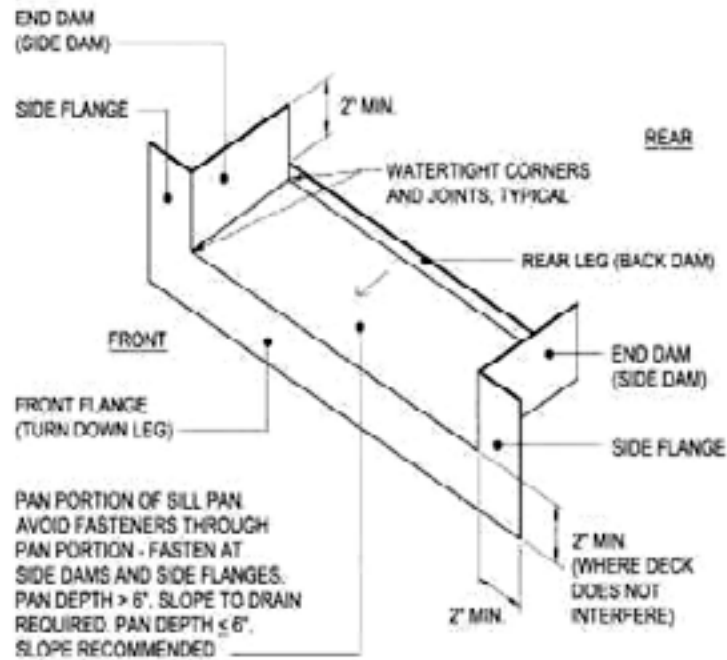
Configurations of Typical Sill Pan Flashing—Isometric
